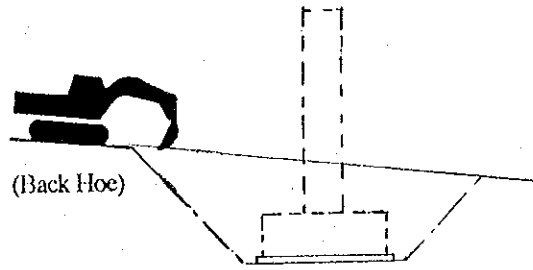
(1) Construction Method of Road Bridges
